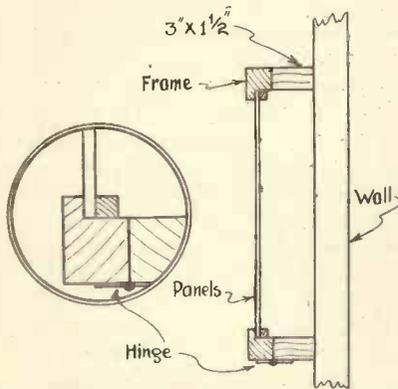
Diagram showing the suggested method of fixing the meter panels.
